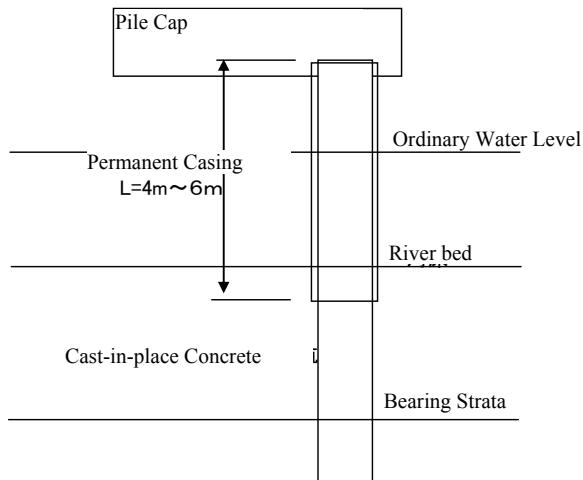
Pile Foundation for Bridge No.5
